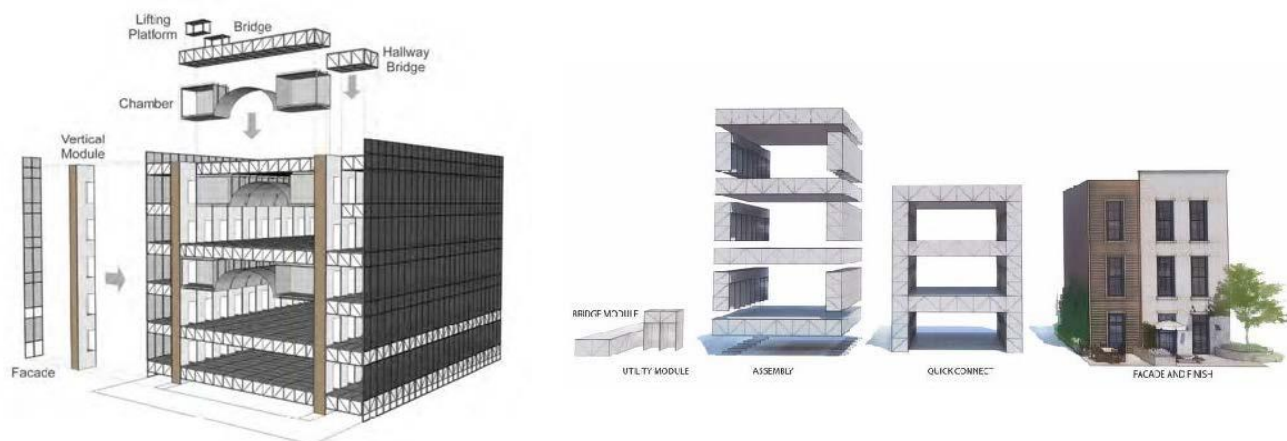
NewVistas buildings are made of modular, stackable, mass-produced elements, as shown above for the multipurpose building (*left*) and the apartment building (*right*).
